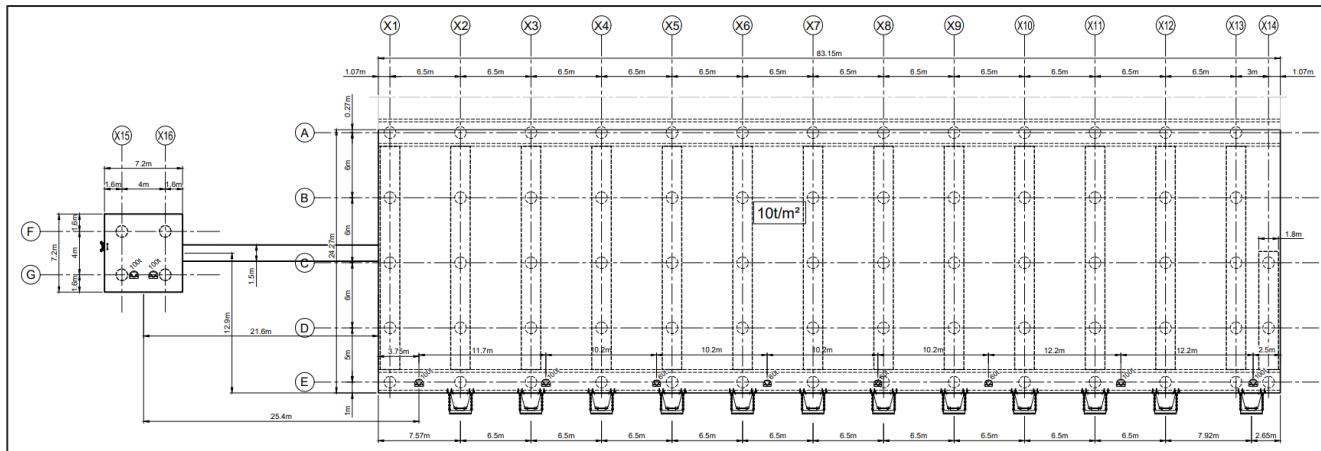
Smith Quay General Arrangement showing proposed pile layout.
